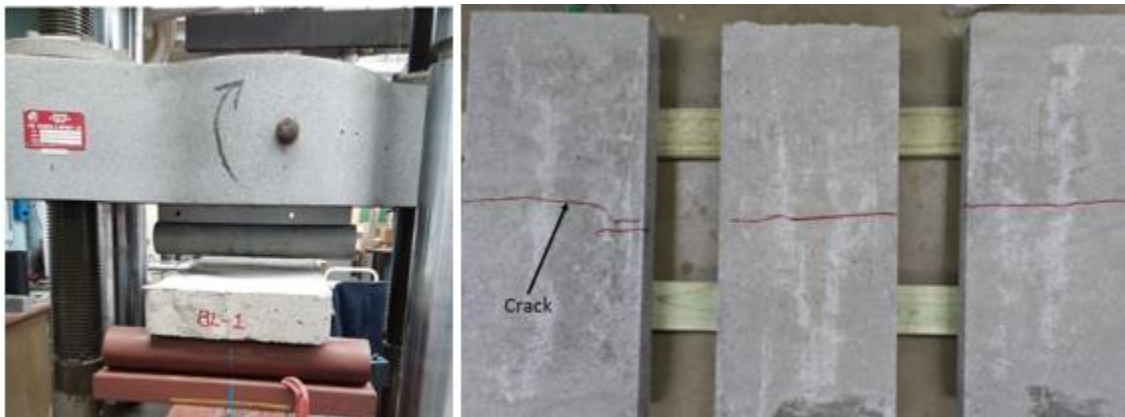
Pre-Cracking of Test Slabs in a Loading Frame Loading (left) and Marking of Pre-Cracks on the Slabs (right)
